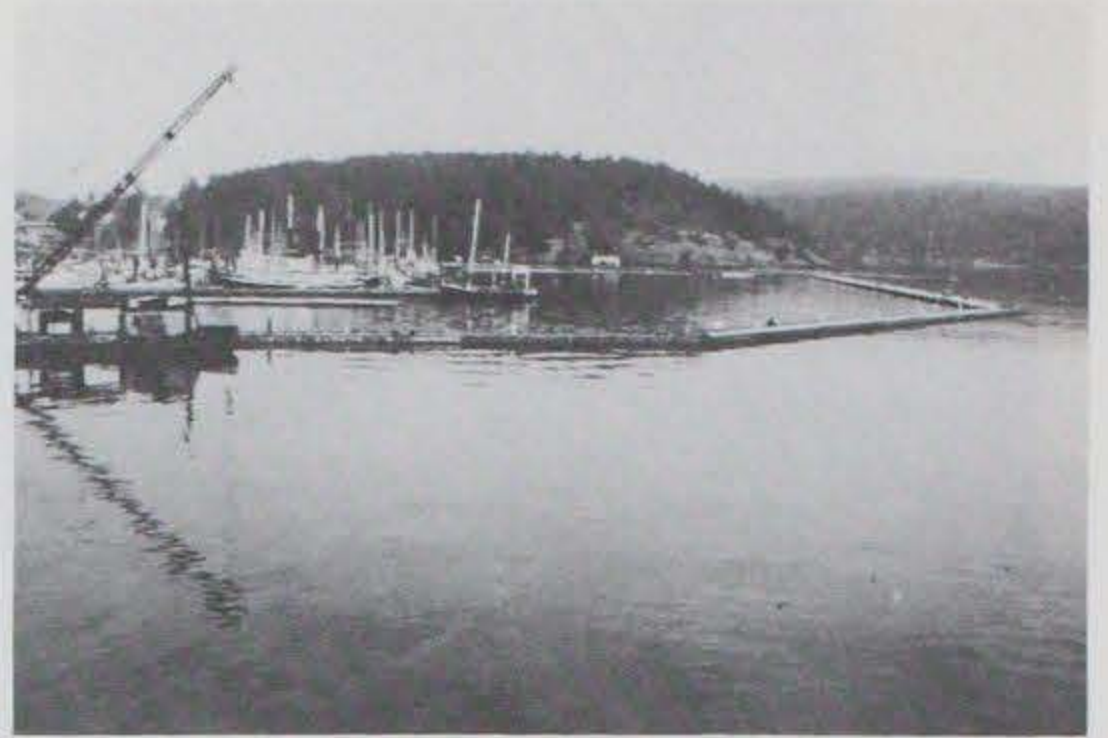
Test units after being connected to the floating breakwater at Friday Harbor, Washington.
